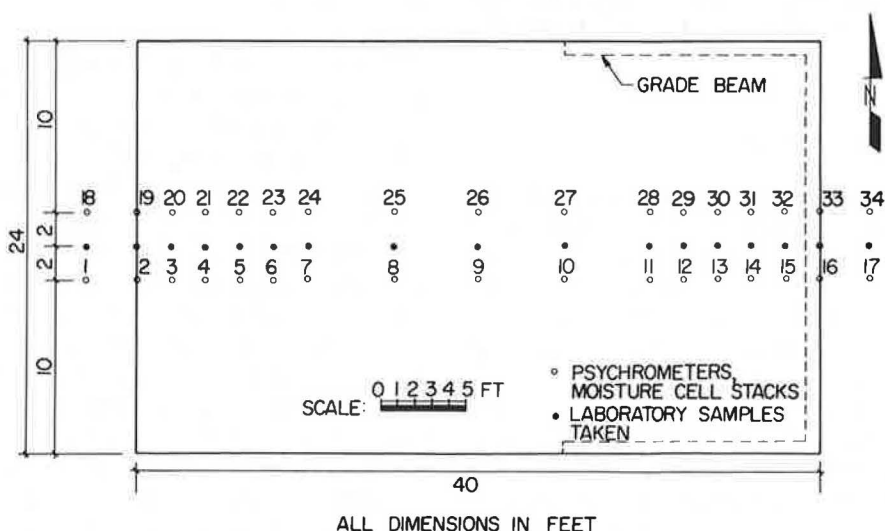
Plan view of slab model showing arrangement and location of the 17 twin instrument stacks (borings 1-34), location of borings taken for soil classification and laboratory testing, model dimensions, and location of perimeter grade beam.
